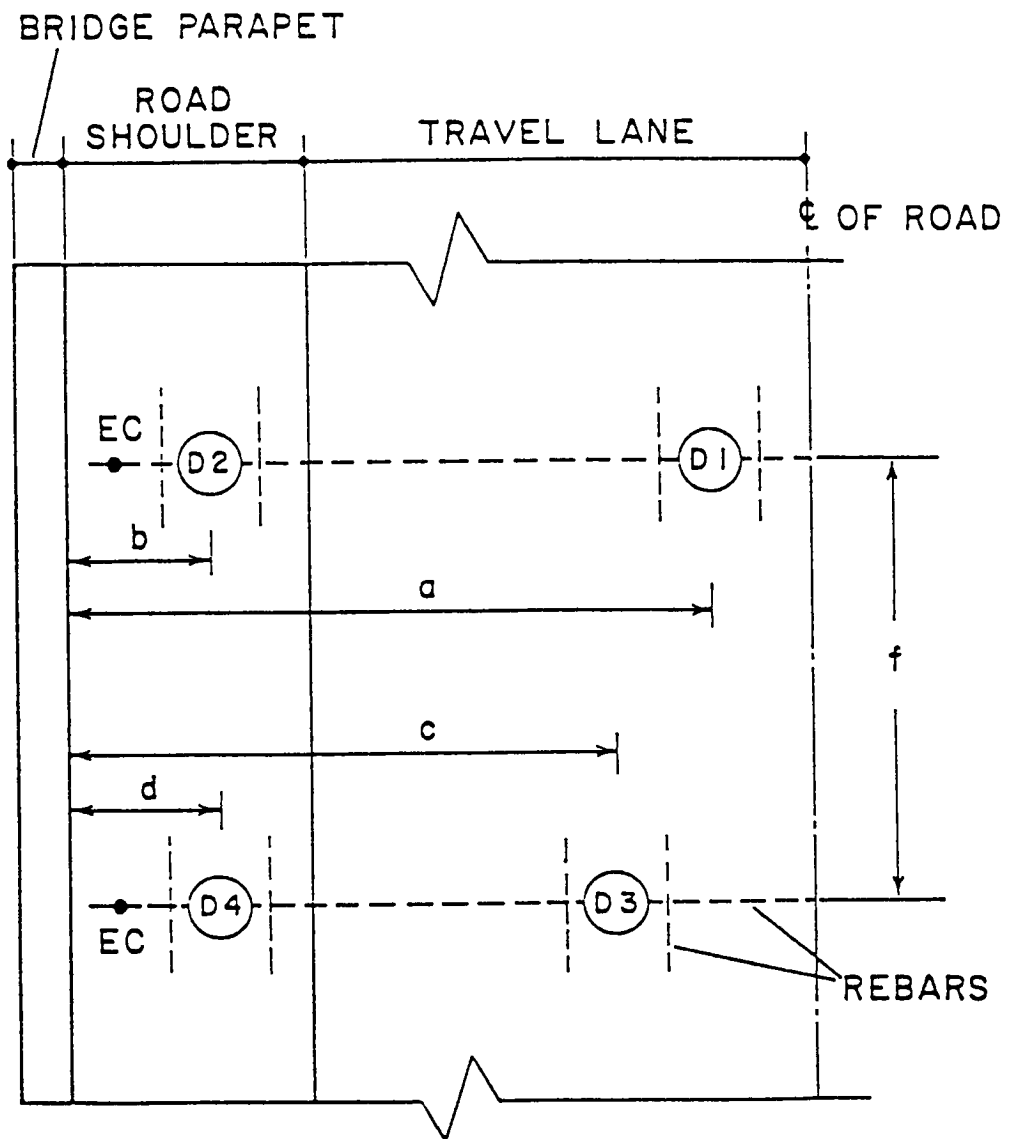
Position of test sites D1 to D4 on bridge decks; EC denotes electrical connection with rebars, a to f denote distances (see Table 5-1).
